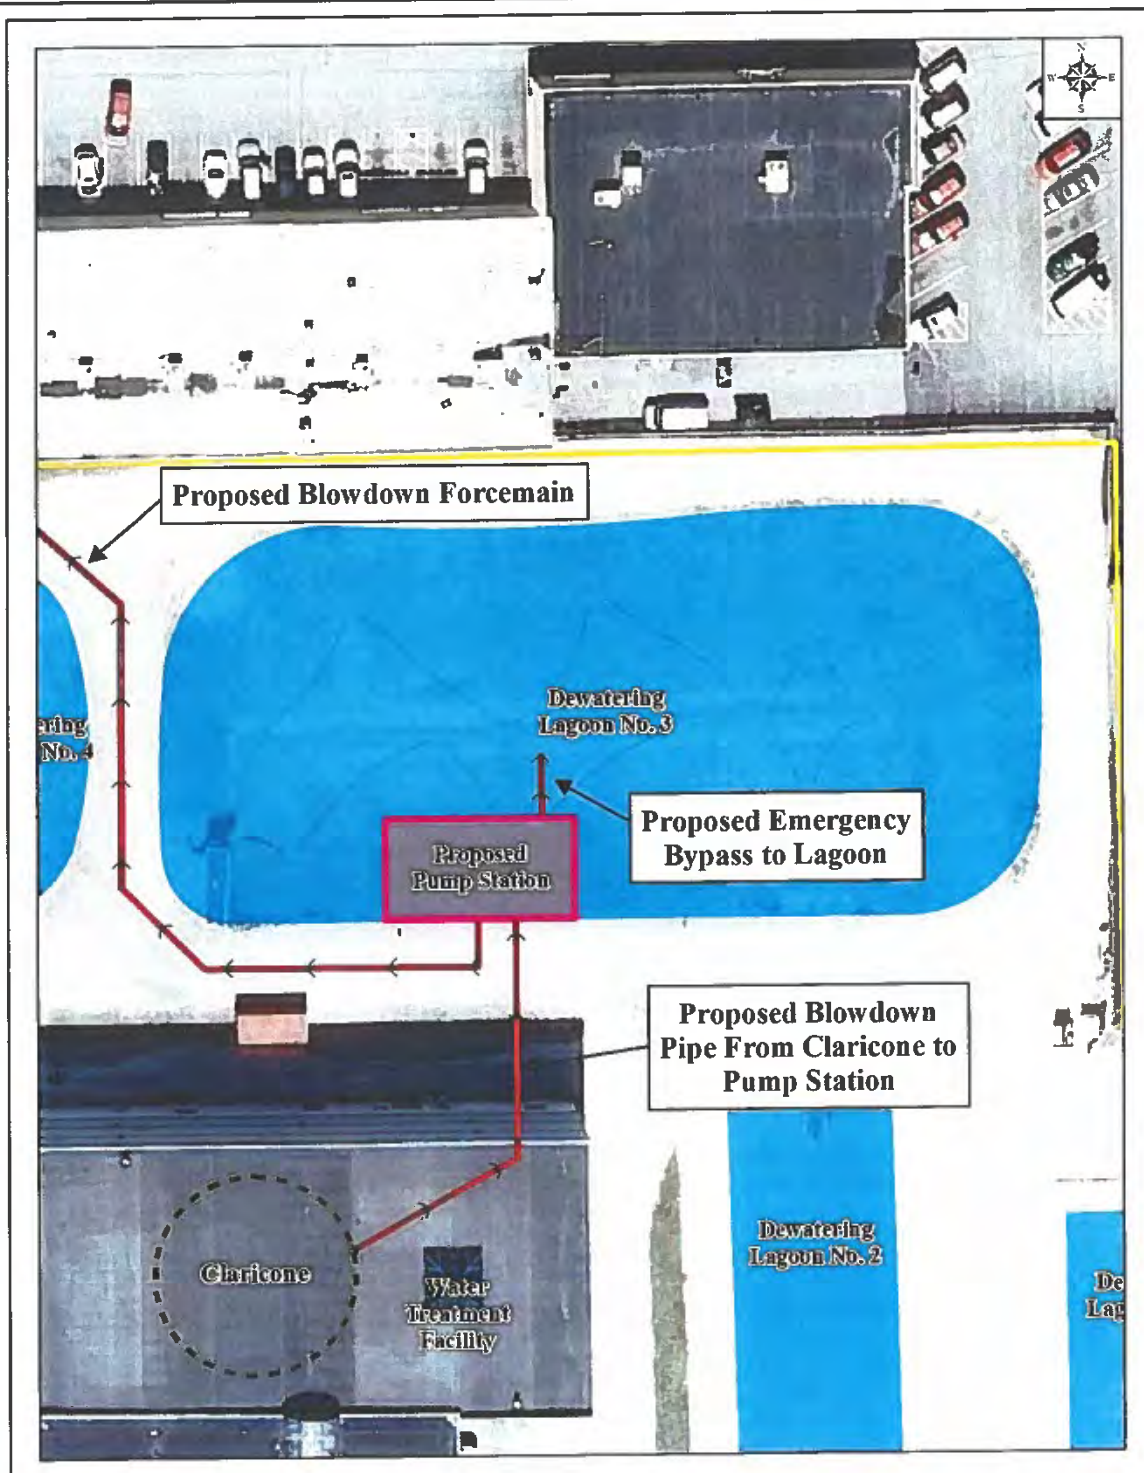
WTP layout, dewatering lagoons, pump station and forcemain
